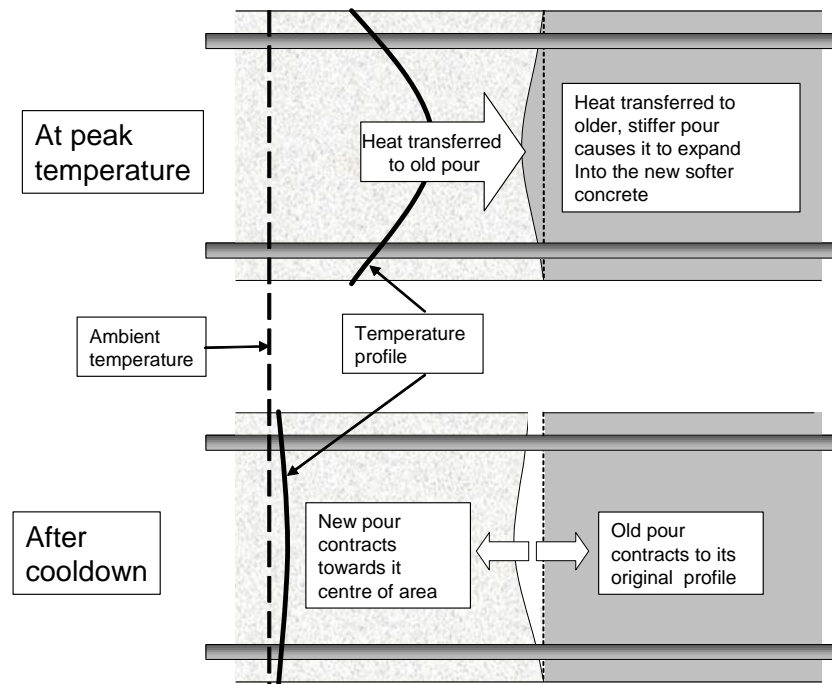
The mechanism of joint opening between adjacent thick sections
